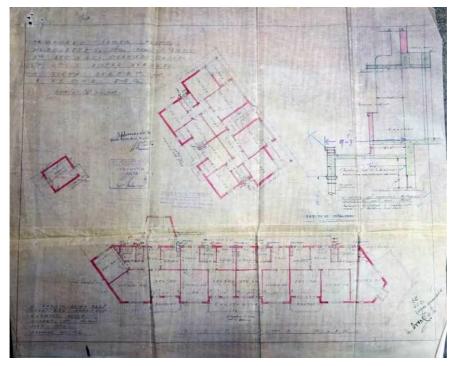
Floor plans for proposed shops, flats and maisonettes on Stand 450, Orange Grove from 1936
